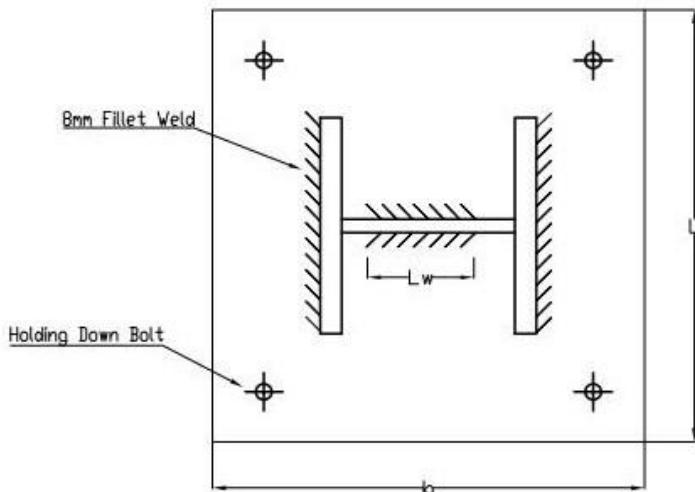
Figure showing the cross-section of the column base joints considered in this project.
